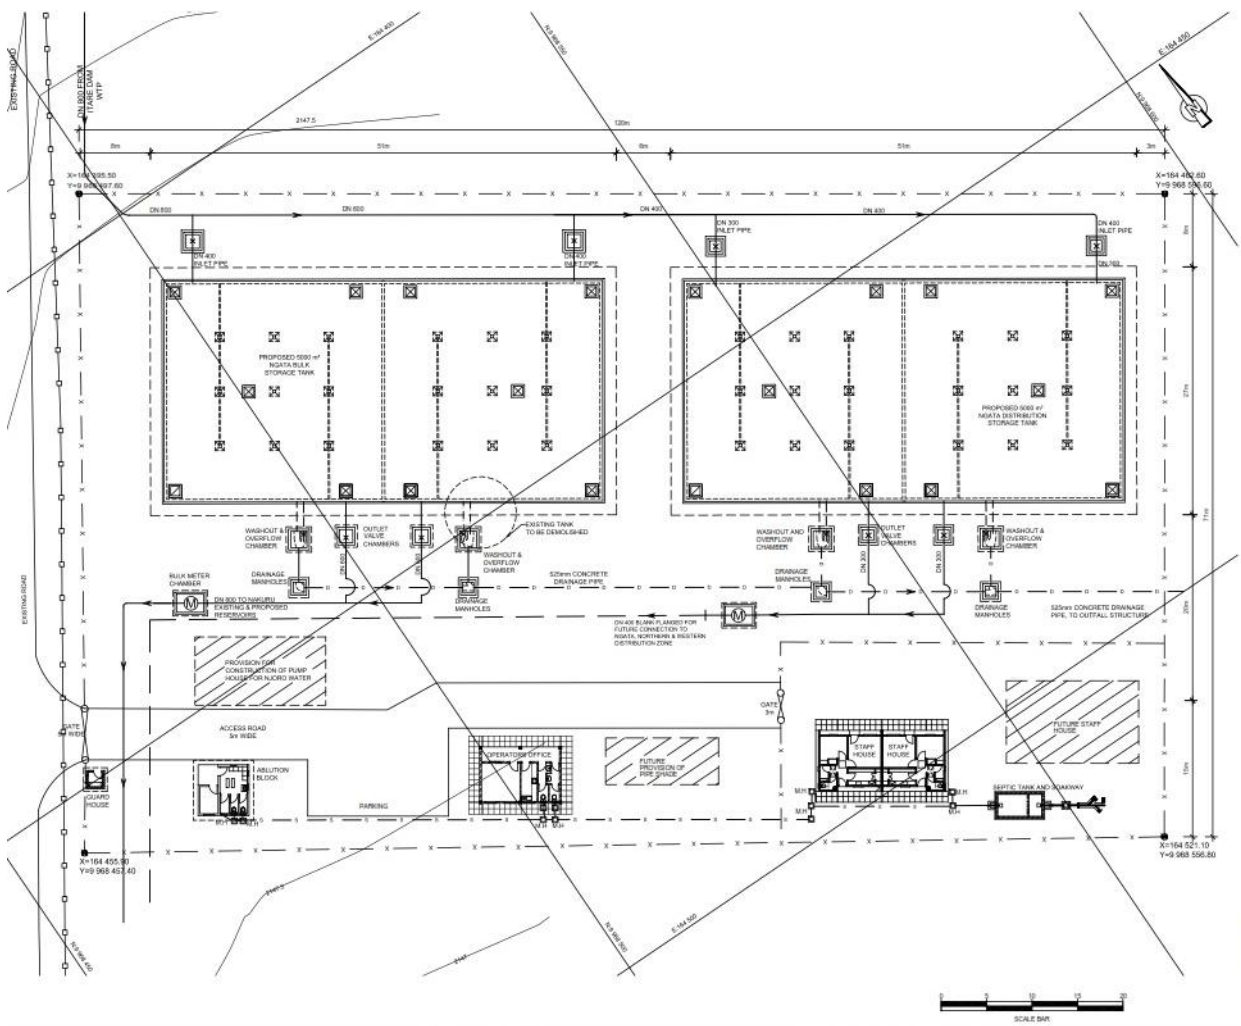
Proposed Ngata Bulk Reservoir Site layout
